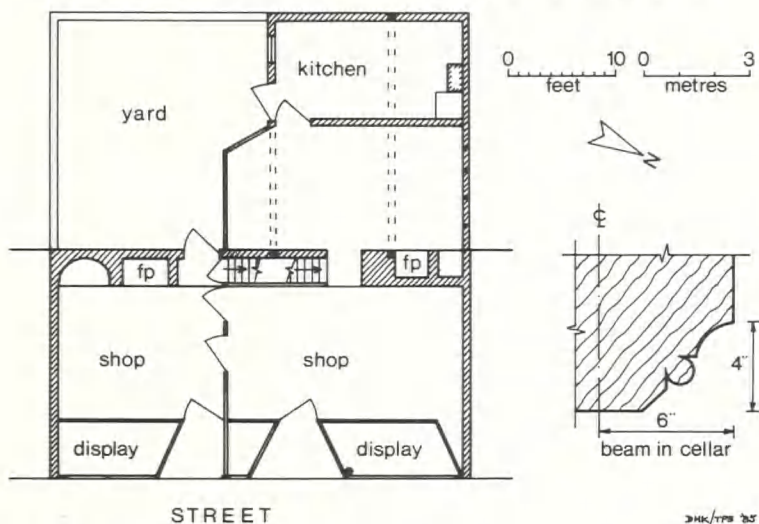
Sketch plan of ground floor of 16-16A Park Square, Luton. Inset shows beam in cellar.
